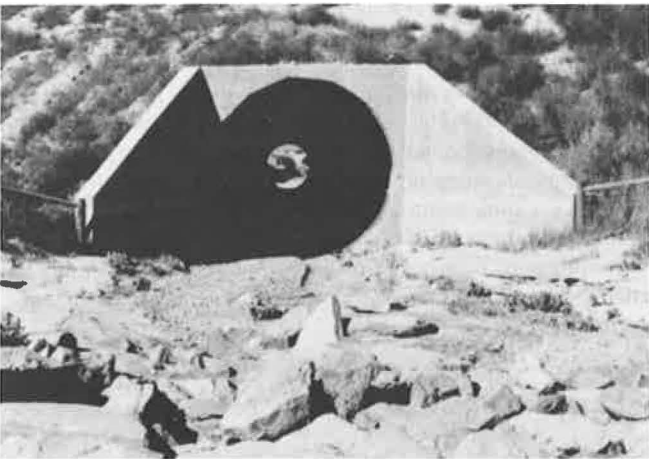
Completed inlet headwall and wingwalls at Deep Creek.
